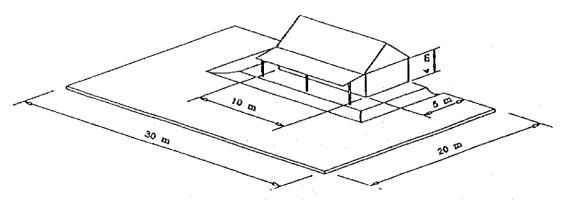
Proposed Post - Harvest / Marketing Warehouse with Drying Yard
